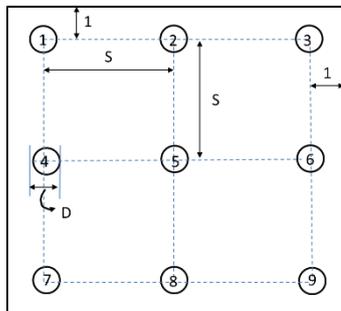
Plan view of a 3x3 piled raft foundation and its orientations
